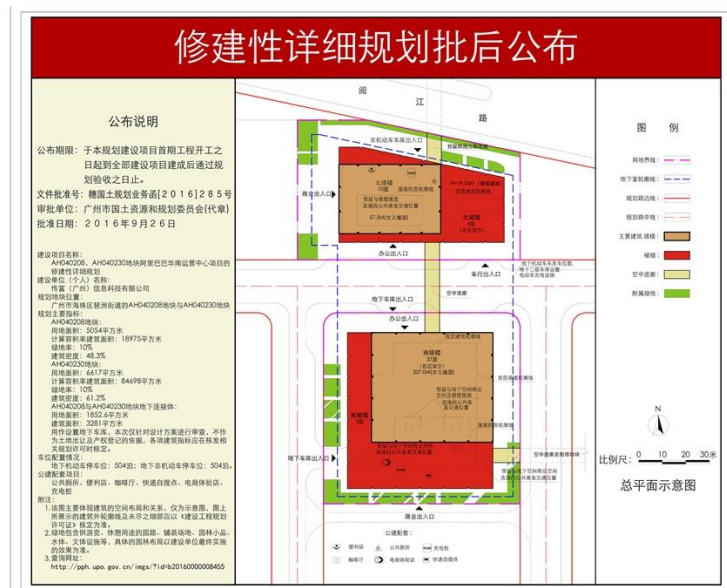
Publicity after approval of the detailed construction planning of Alibaba building in the governmental website
